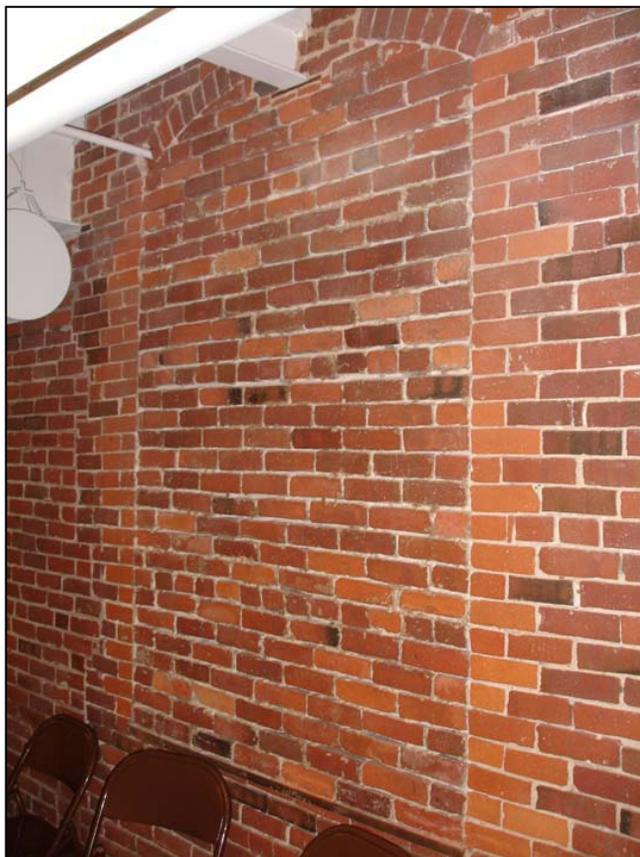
Building 27 first story, Room 108, east wall showing bricked-in window, 2010.
